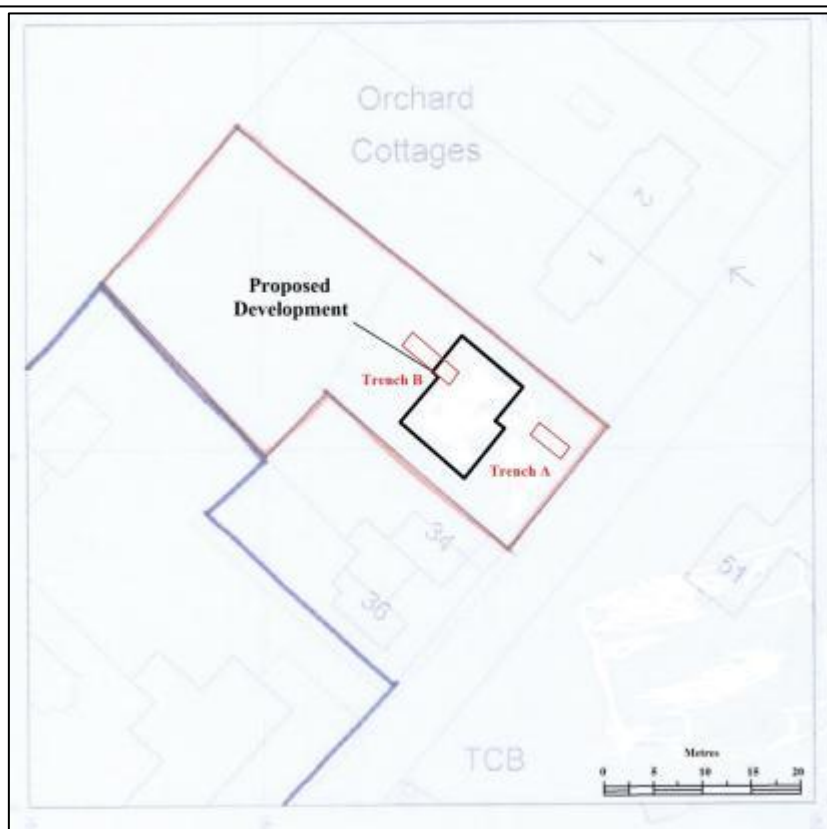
Land Adjacent to the Rose Cottage, Alciston: Site plan showing the location of the trenches
